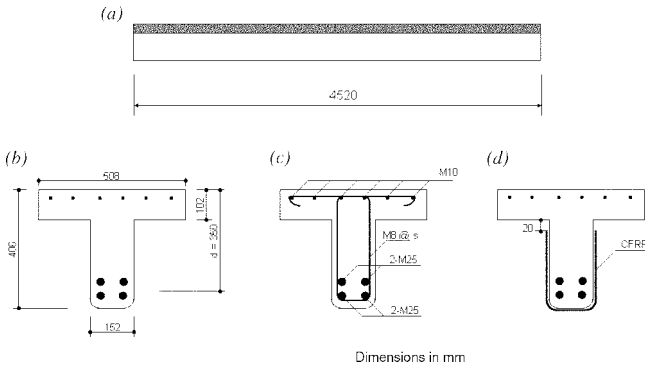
Details of specimens: (a) elevation; (b) cross section with no transverse steel; (c) cross section with transverse steel; and (d) wrapped cross section.
